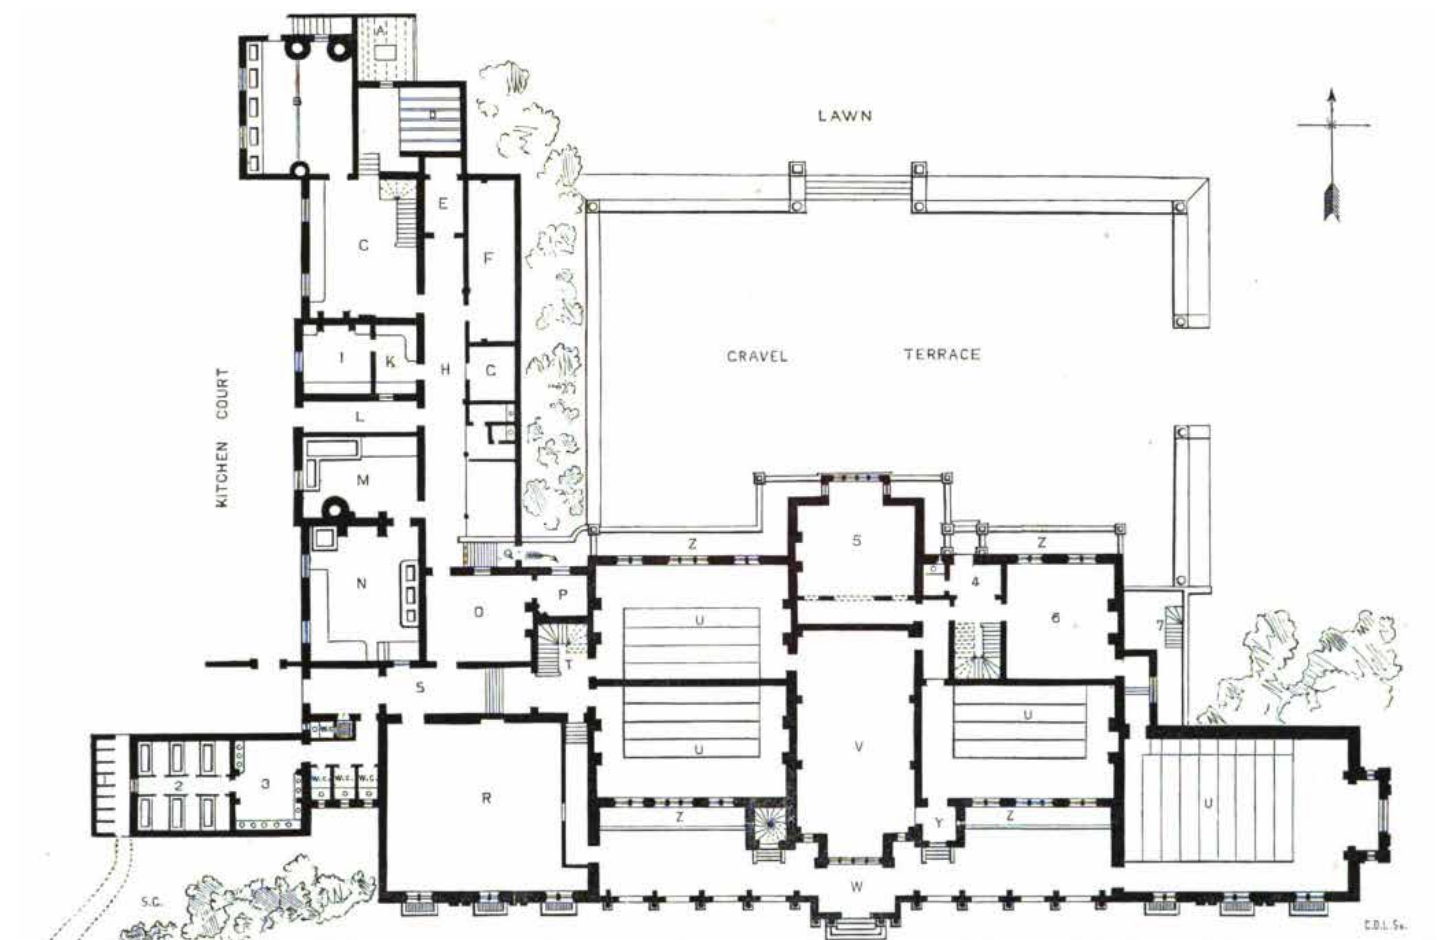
1850 plan of the completed ground floor level following the hall's conversion
